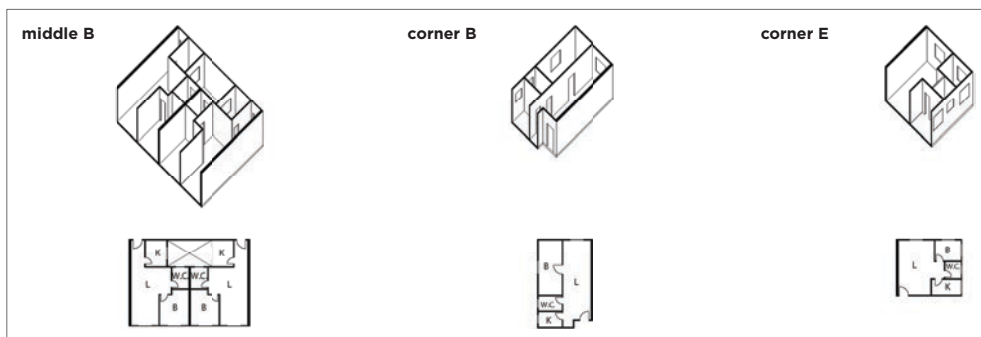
Building level: An illustrated lift structure and unit circulation of the Metropole Building.
